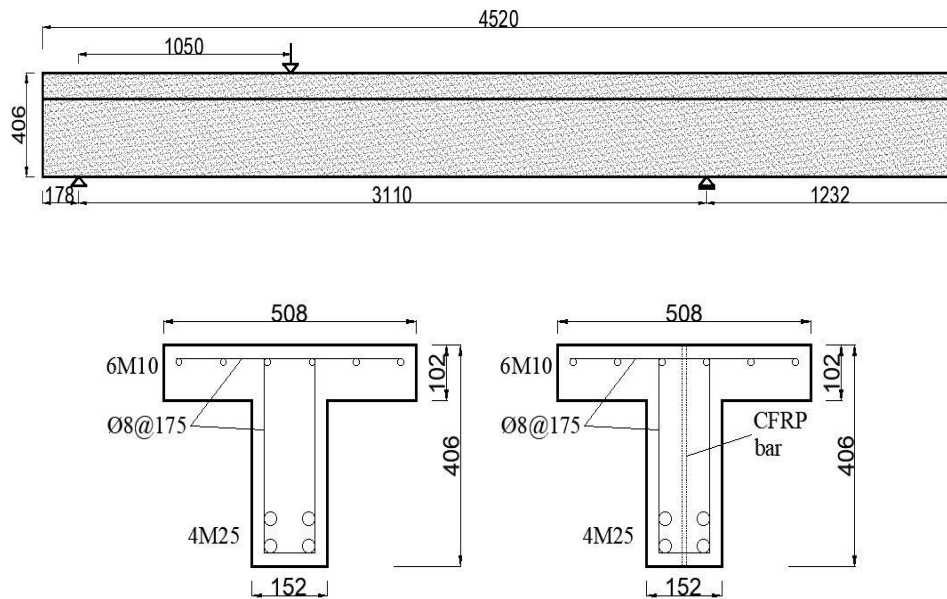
Elevation and cross-sections of the beams tested by Mofidi et al. (2012a)
